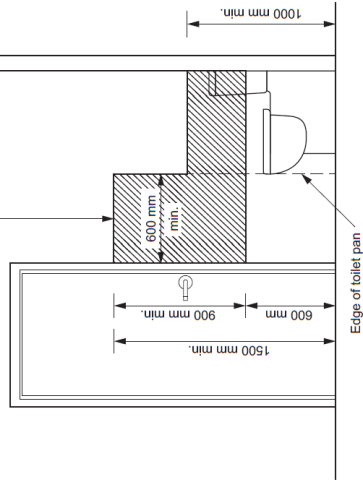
Location of noggings for a wall behind a toilet pan
